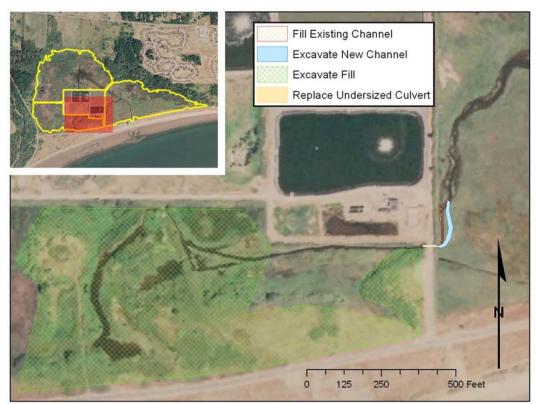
Fill remaining onsite from past construction will be removed. Portions will be used as fill in other areas of the site, and the remainder will be wasted elsewhere onsite. An undersized
